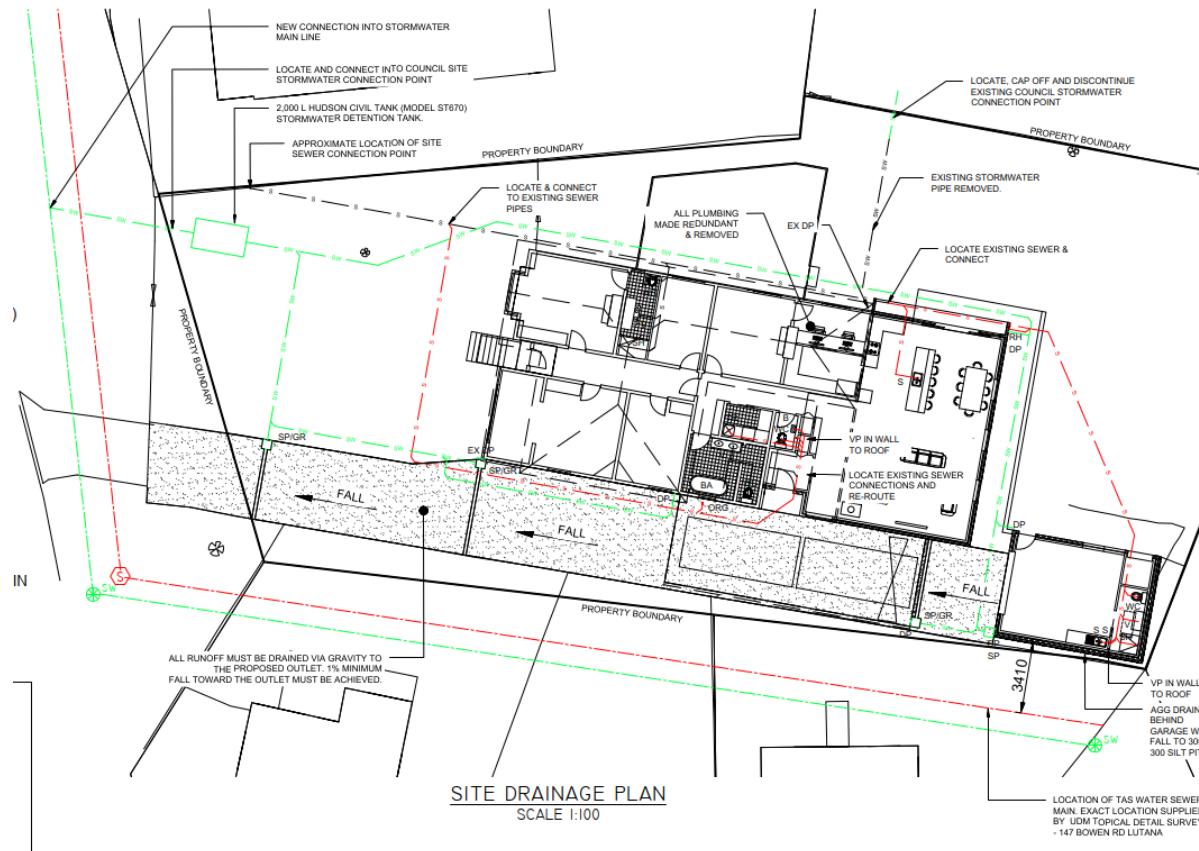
Proposed Stormwater and Catchment Plan to Detention Tank
